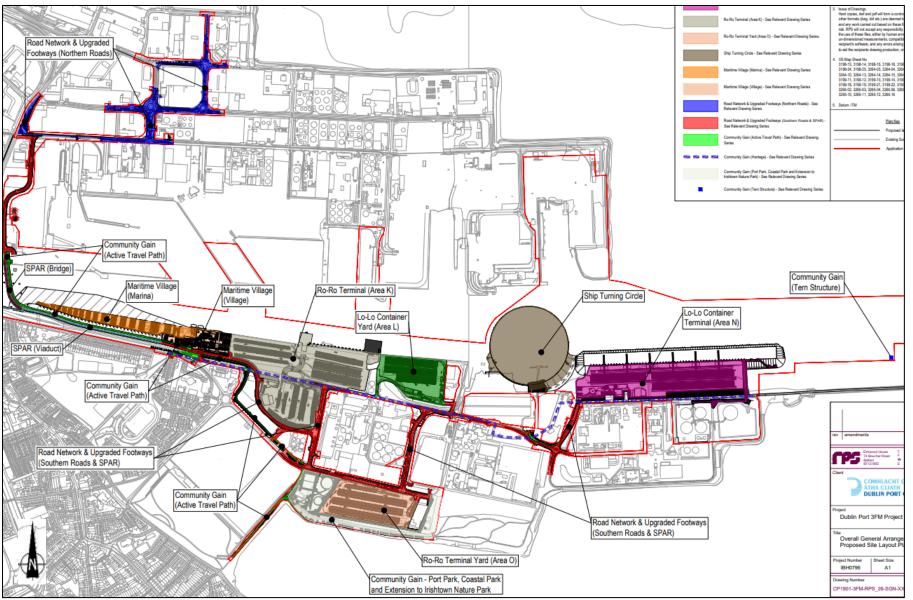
Proposed Site Layout Plan - Key Plan Source: Drawing No CP1901-3FM-RPS_26-SGN-XX-DR-HE-1200-0001 prepared by RPS
